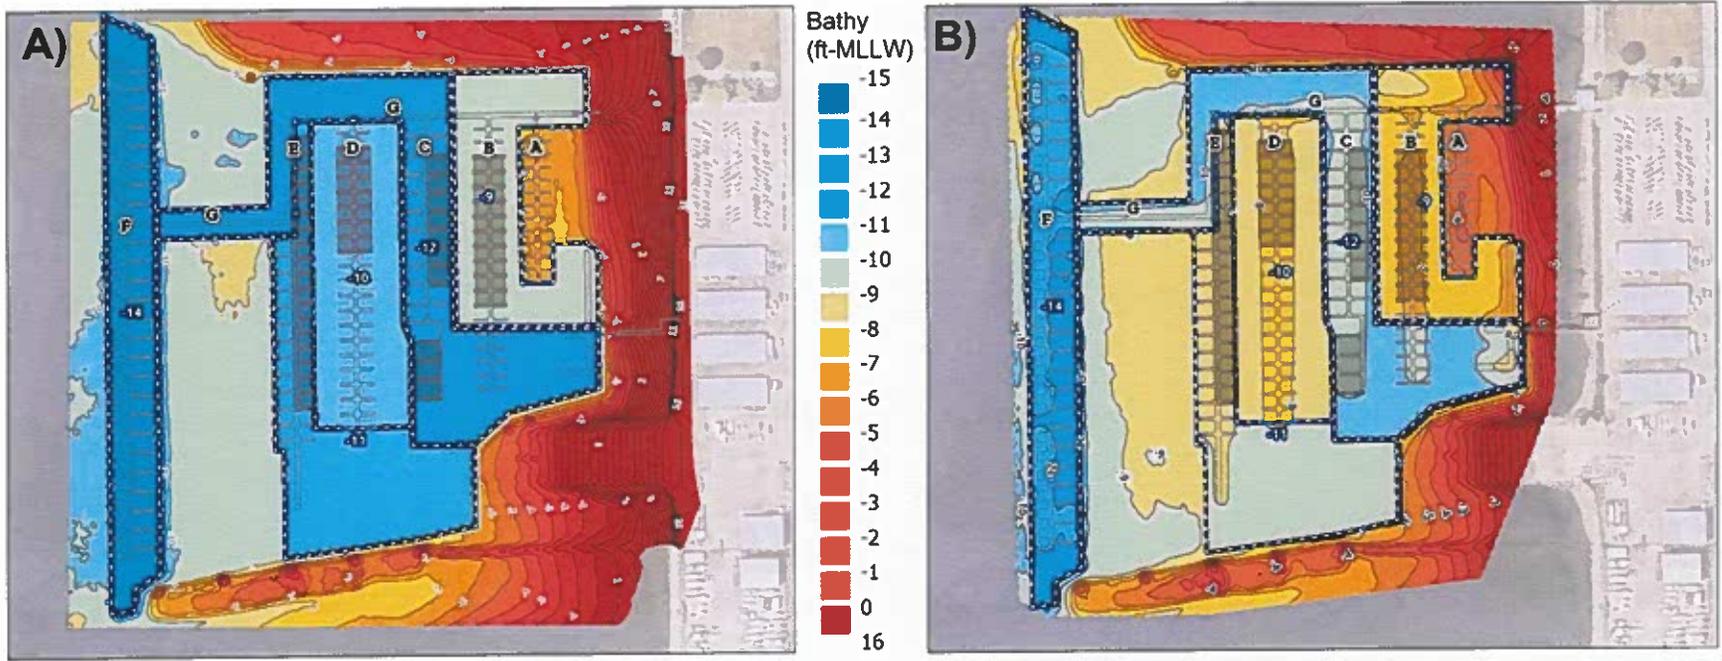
Alternative 4 Dredge Plan (A) and Dredge Plan Aged 10 years (B)
